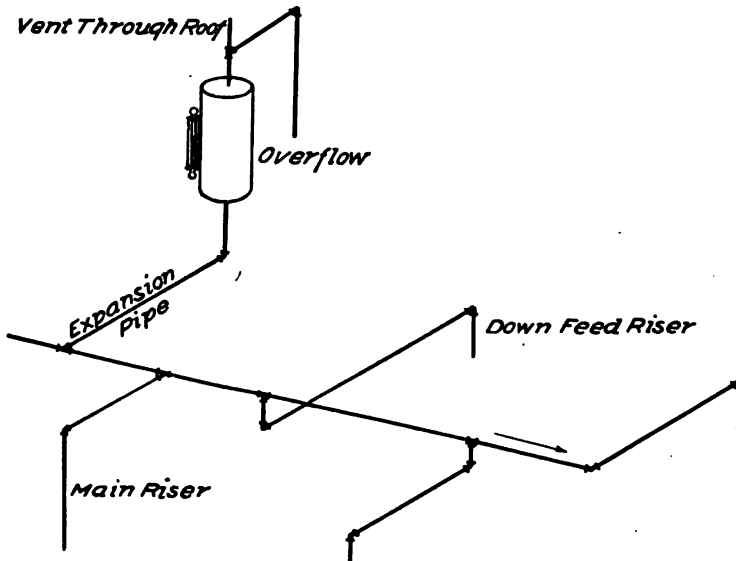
Showing the Mains and Branches Pitched Down Towards the Risers.
